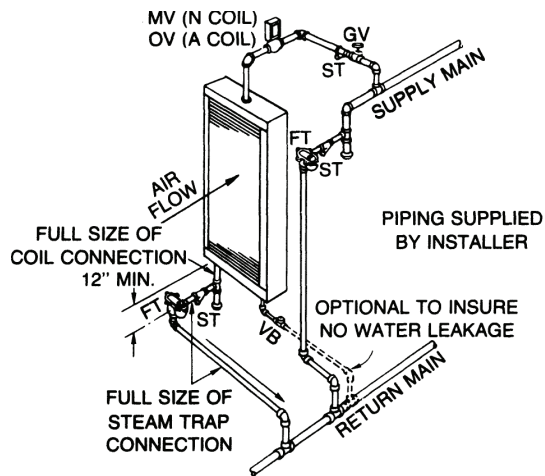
Typical piping for type T steam coils, horizontal tubes for horizontal airflow
